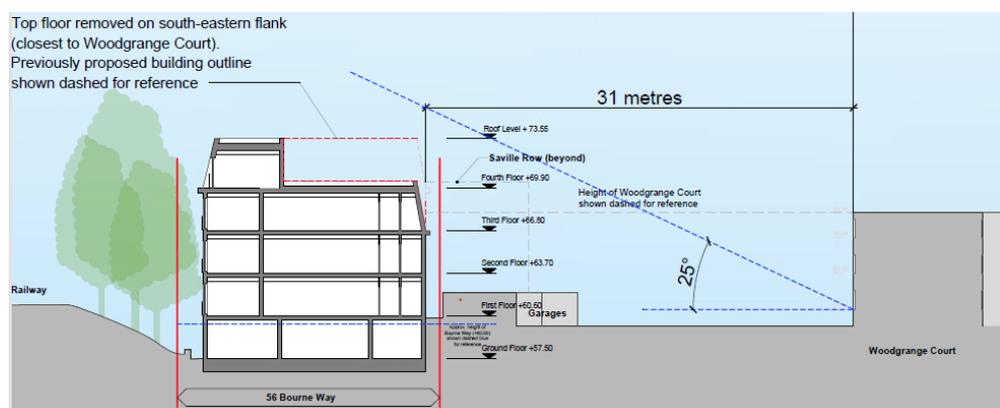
Proposed section drawing – 25 degree line Woodgrange court
